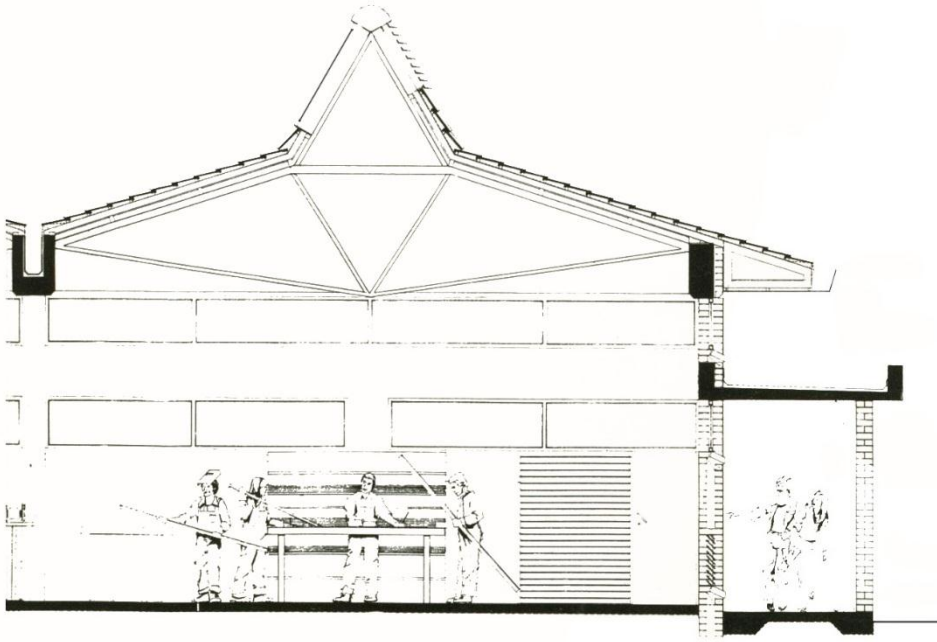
Typical section through a workshop (Adapted from New Cato Manor Technical College, 1994: 19).
